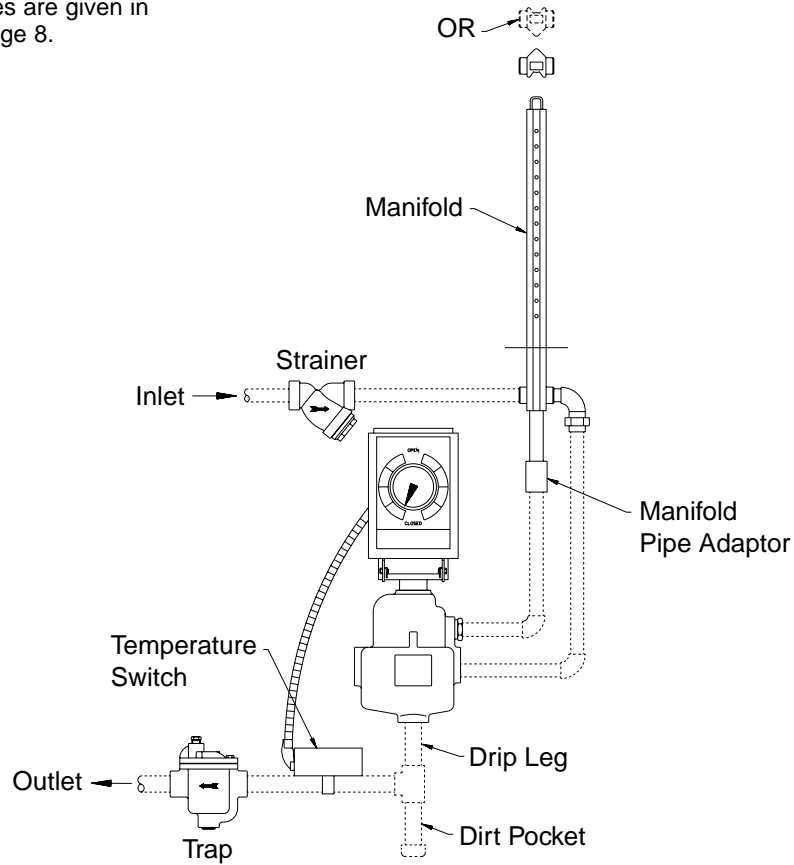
Connection size and dimensions of manifold with pipe adaptor
